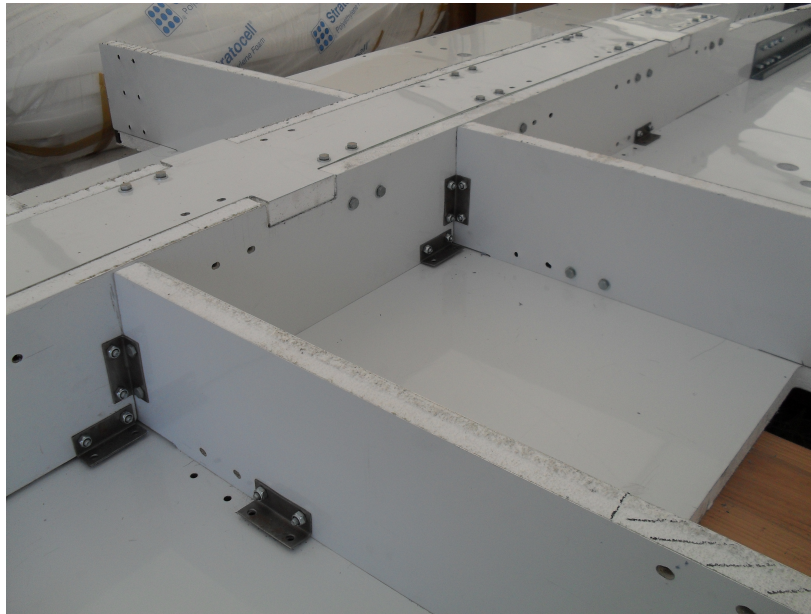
PROTOTYPE 1 SHOWING BOLTS AND BRACKETS
